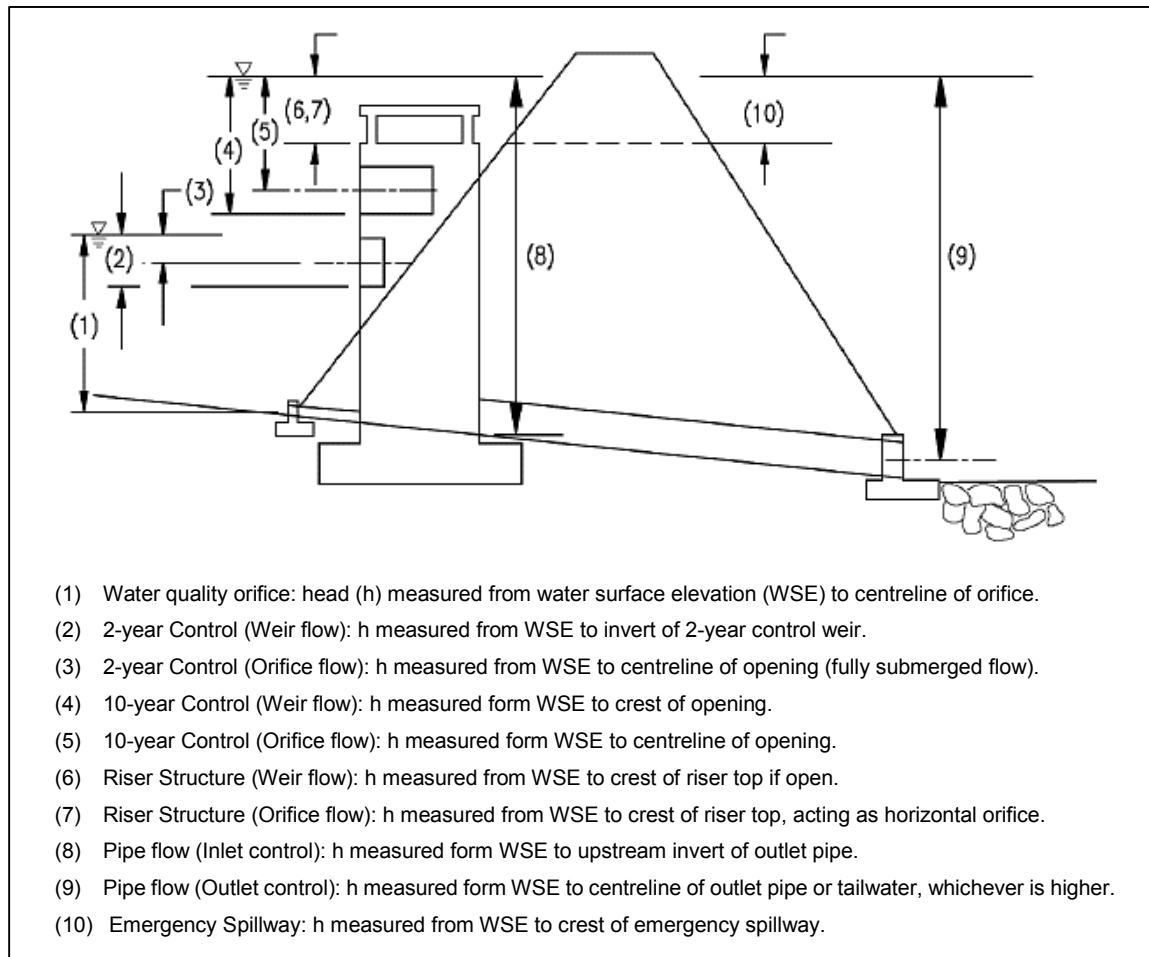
Head measurements for multi-stage riser outlet device (adapted from Virginia Department of Conservation and Recreation, 1999b:5-55)
